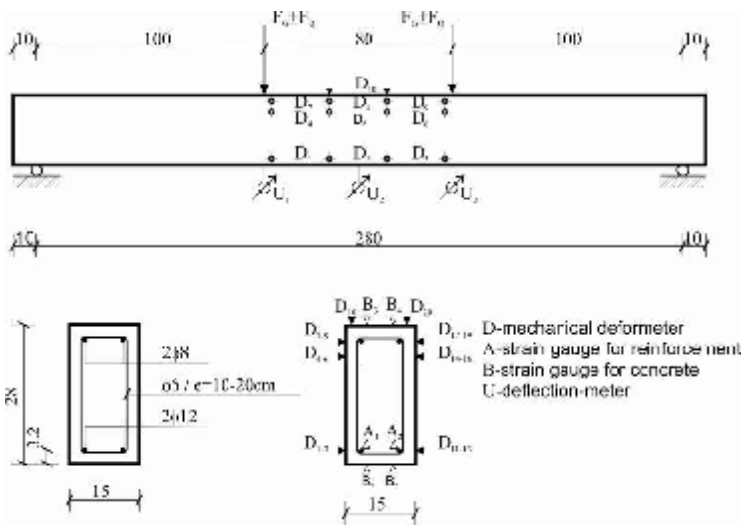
Reinforced concrete beams for testing and position of the measuring points
